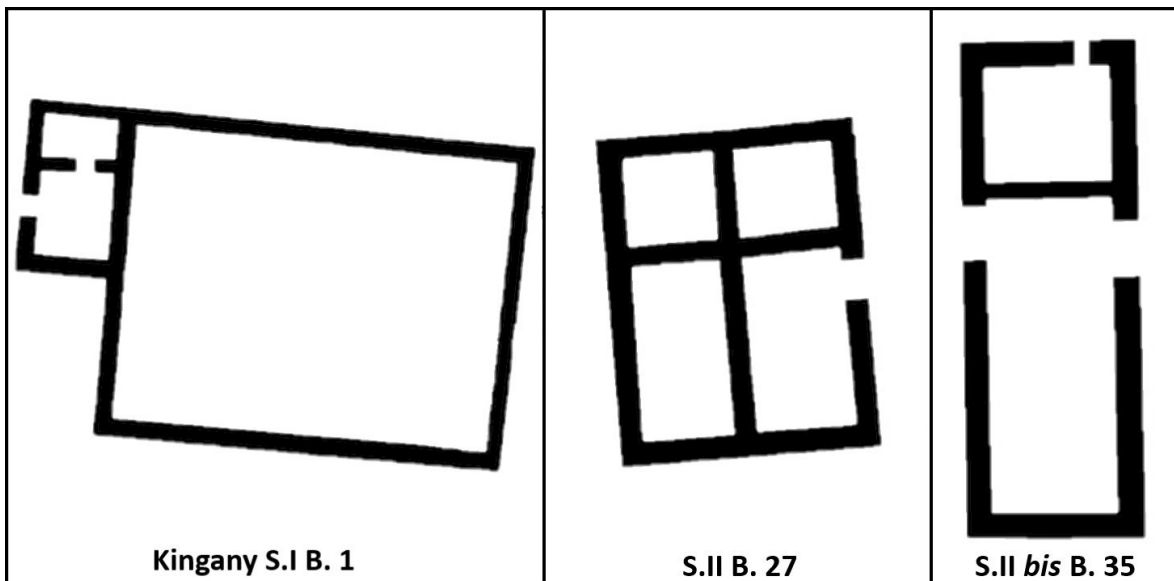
Simplified houses plans at Kingany. Site I Building 1, Site II Building 27, and Site II *bis* Building 35.
